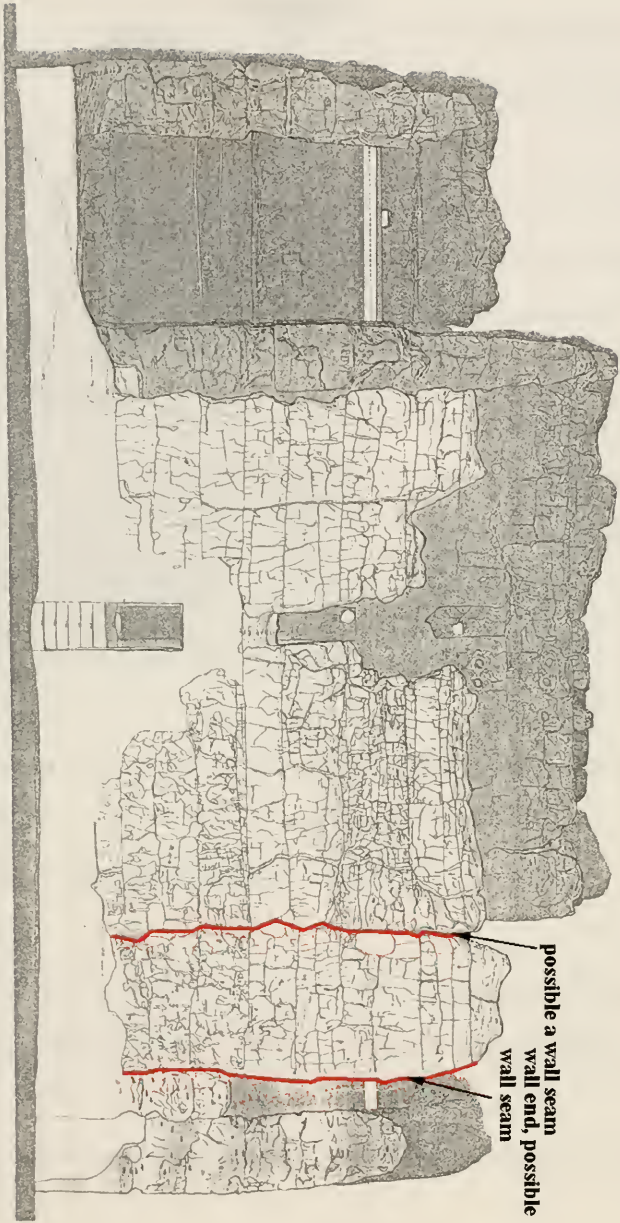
East elevation with evidence of tier construction (Myra, P and E. Borchers, Terrestrial photogrammetry of the Great House, 1979. Courtesy Casa Grande Ruins National Monument)
